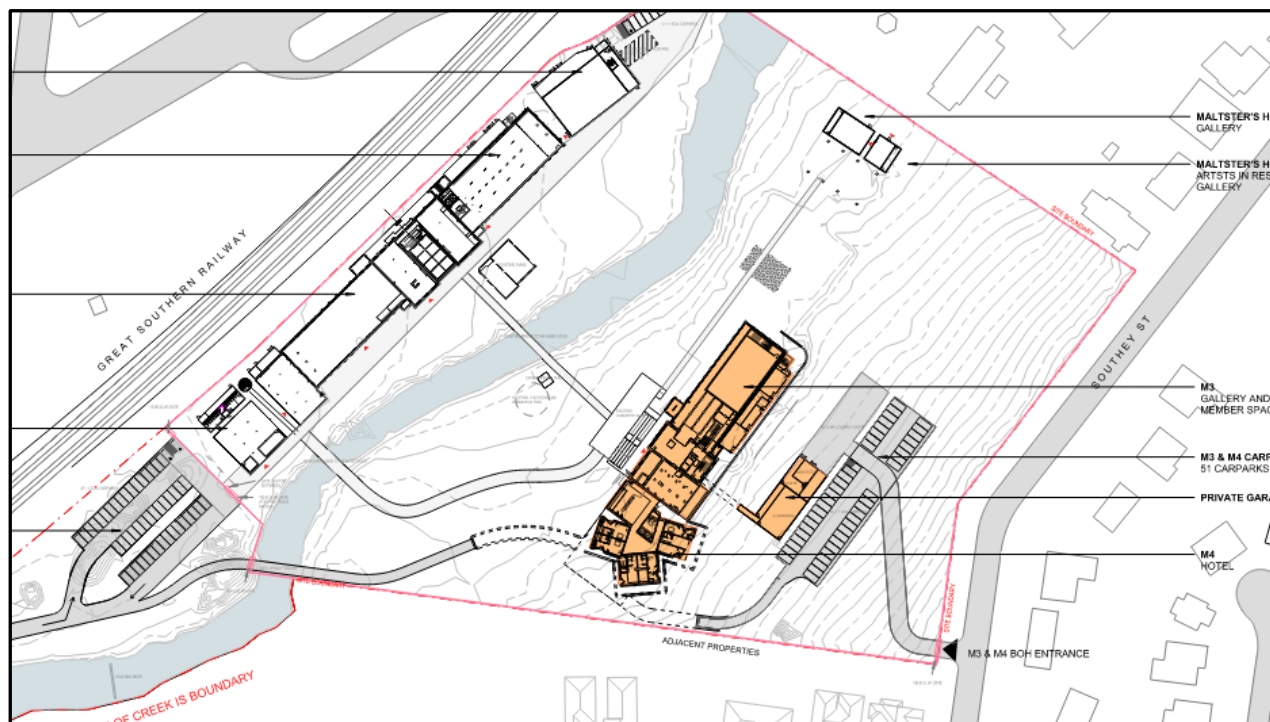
Site plan of new works – M3 + M4 highlighted in orange
